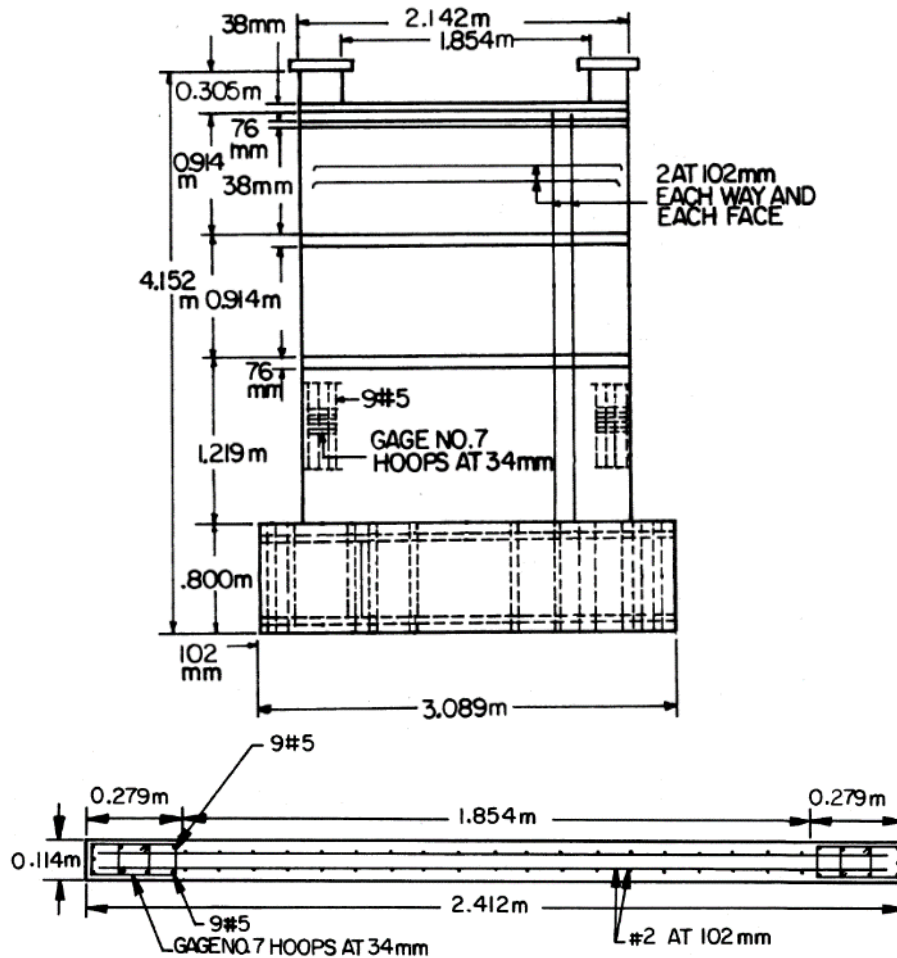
Test Specimen Geometry and Reinforcement Details for Specimen S6 of Vallenias et al. [167]
